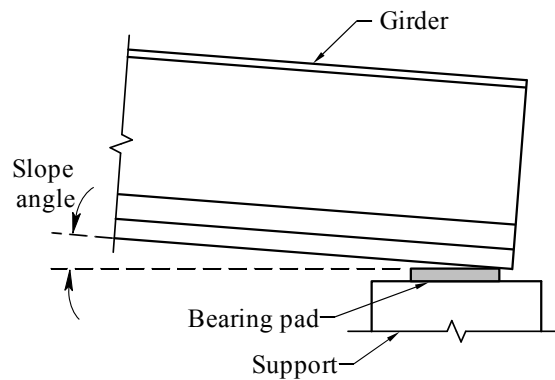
Elevation view of girder, pad, and support with slope angle defined
